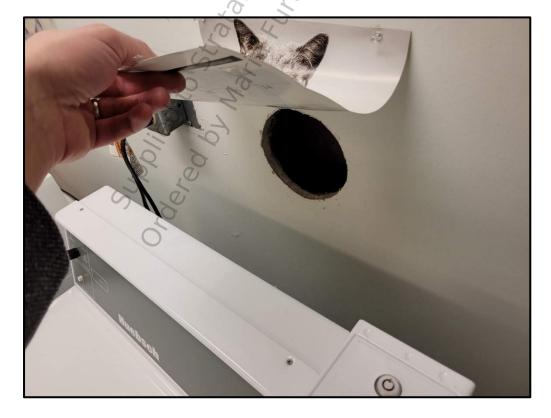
(C30 00 00.04) - Unsealed Opening in the Wall Adjacent to the Mechanical Room
